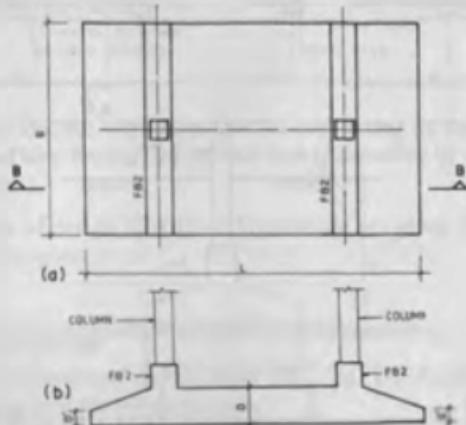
B. Combined footings with three alternatives. (a) Plan of combined footing with two cross beams at column points; (b) Section B-B.
